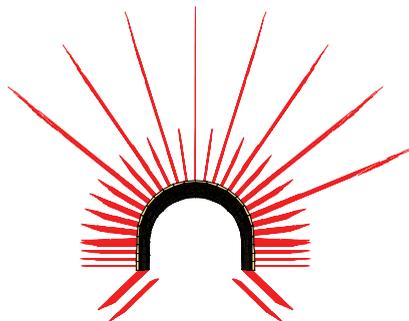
bolting and shotcreting with wire mesh + anchor cable + floor anchor
